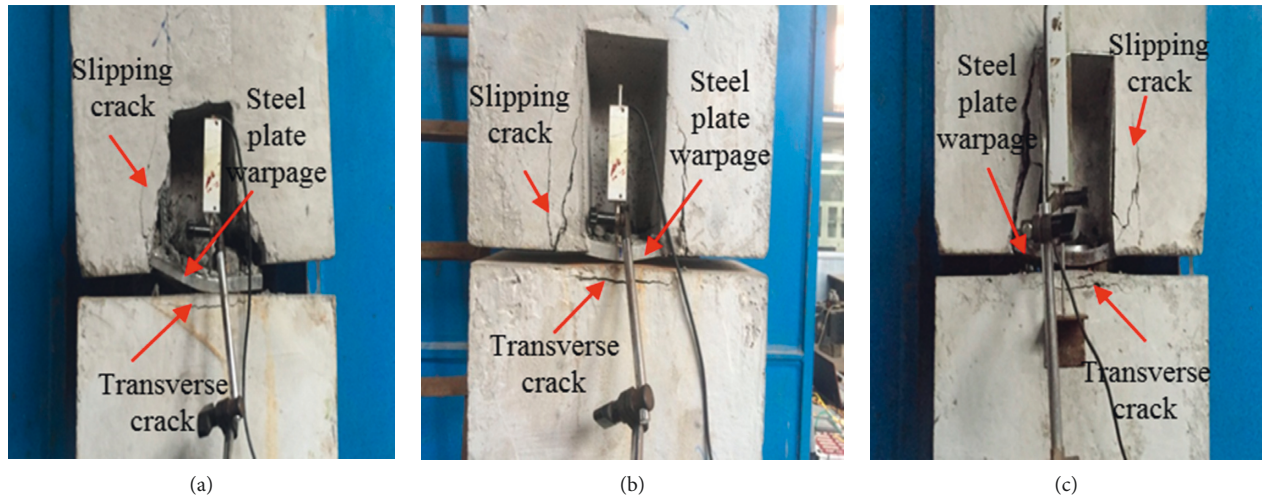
Failure modes of the specimens during the tensile test: (a) T1, (b) T2, and (c) T3.
